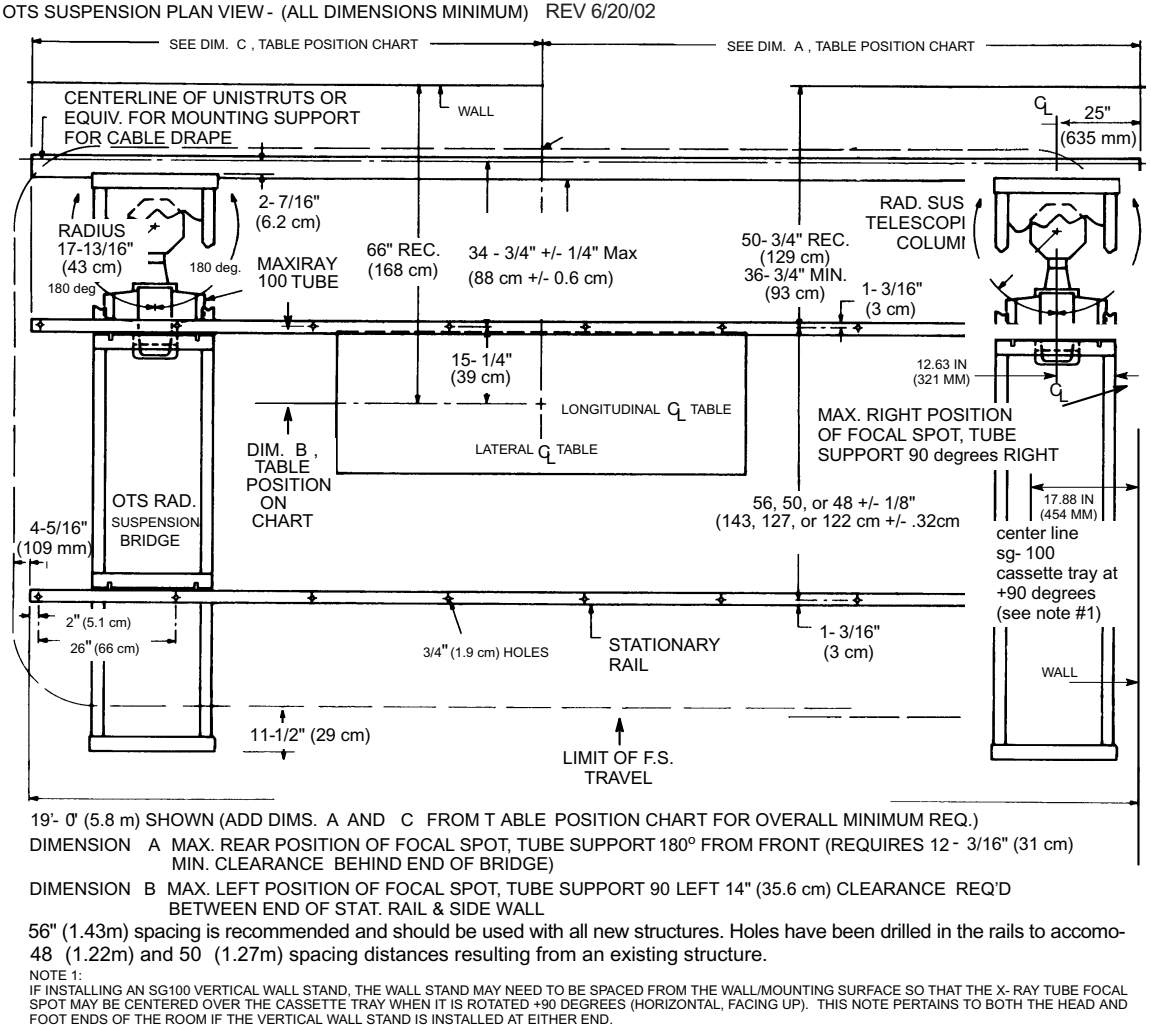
OTS Suspension Plan View - (All Dimensions Minimum)
